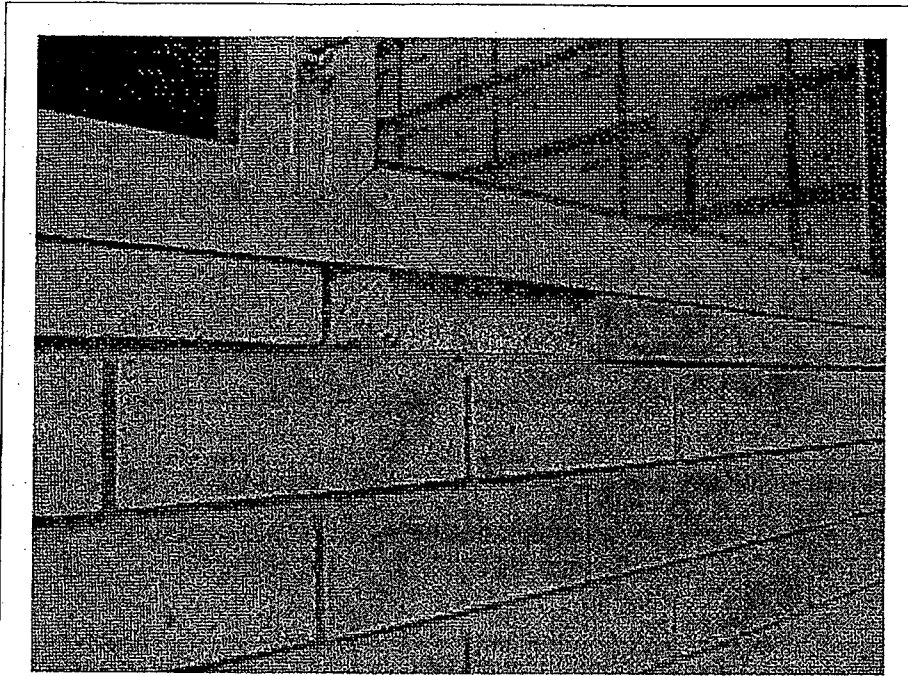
Brickworks – Surface erosion of brickwork (fretting).
